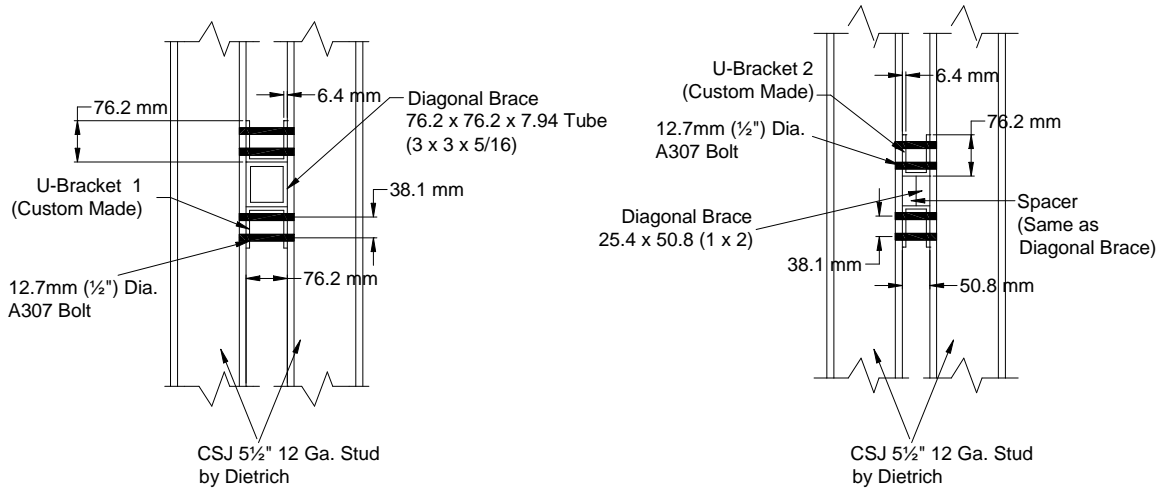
U-Brackets-to-Cold Formed Steel Stud Bolted Connection Details for Specimens F1 and F3
